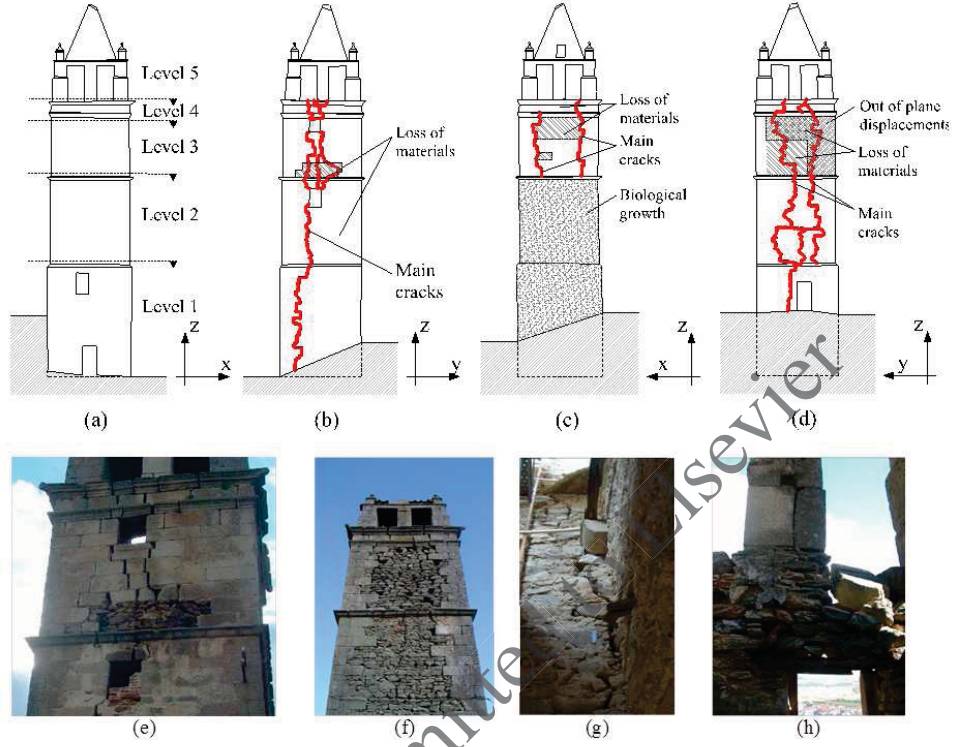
Damage in the tower: (a) South, (b) East, (c) North and (d) West façades; cracks on the (e) East and (f) West fronts; (g) inner crack in the West façade; and (h) example of material loss [44], [45].
